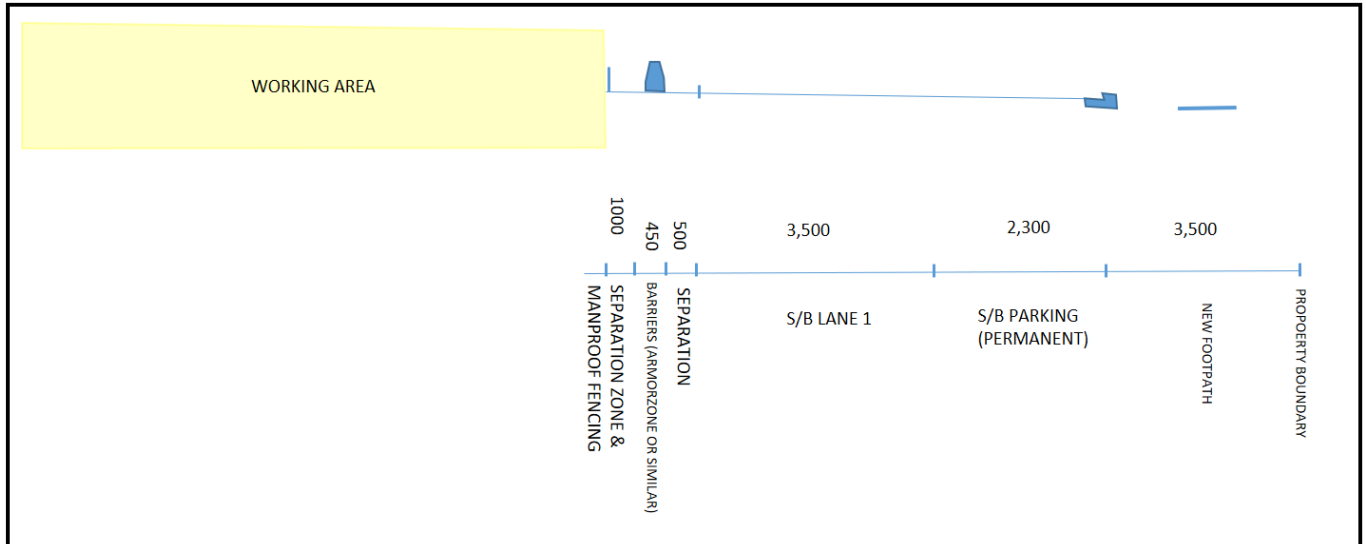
Typical Cross Section of Broomfield St Stage 2 Configuration 1
